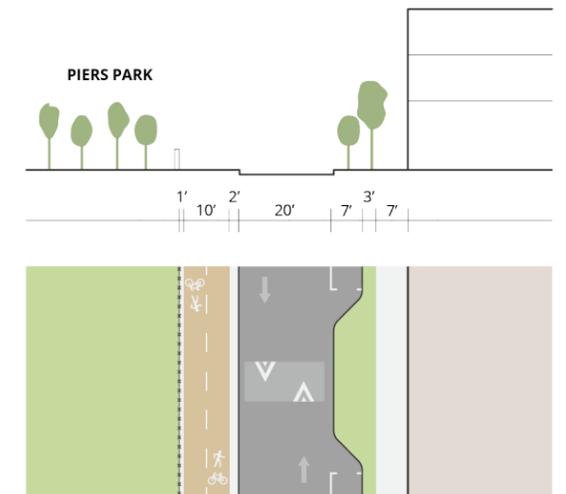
MARGINAL STREET SECTION - PROPOSED CONDITION FOR PUBLIC WAY
